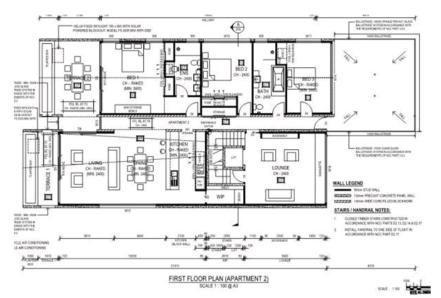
the proposed deck at 324 Davey Street, South Hobart. The deck would be located beside Bed 3 on the right hand side of the image.
